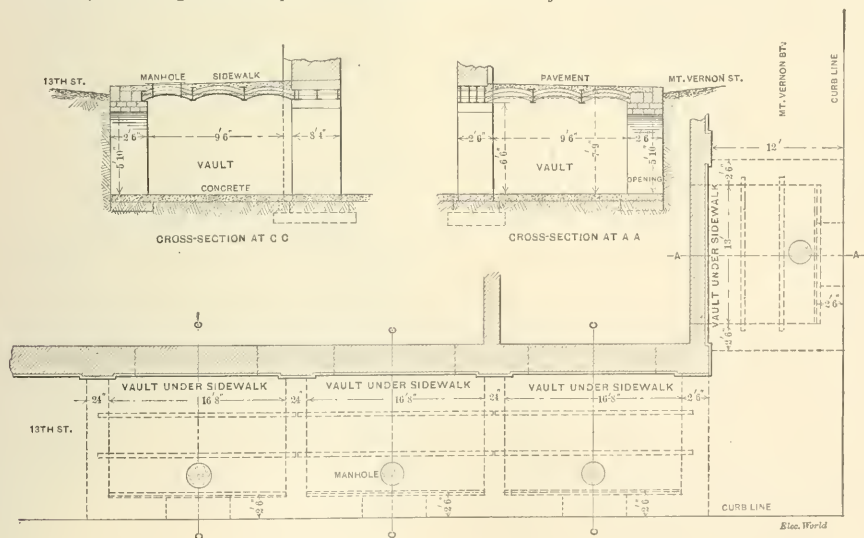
PLAN AND SECTION OF VAULTS UNDER SIDEWALKS, STATION B.
